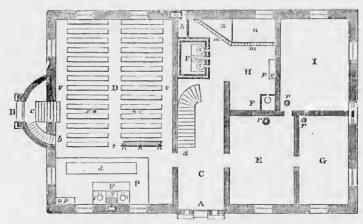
, -Plan of the Hasement Floor, adapted to Fig. 151.
